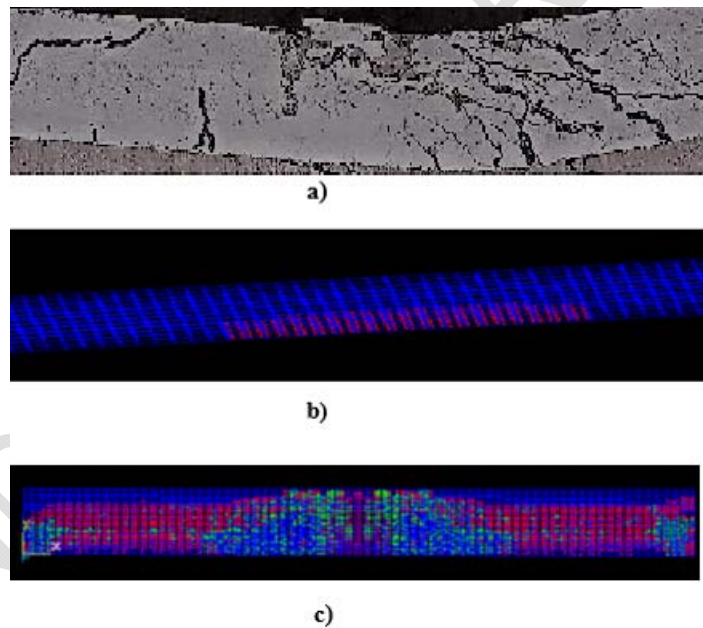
Crack pattern for box beams; a) Experimental crack pattern; b) NLFE crack pattern; c) NLFE cracks till failure.
